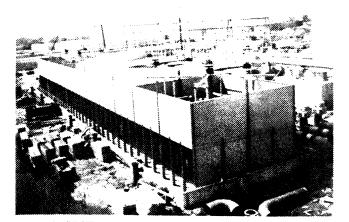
UNILITE modular cooling towers under construction at Westinhouse, Philadelphia, PA. (Courtesy of Composite Technology, Forth Worth, TX.)
